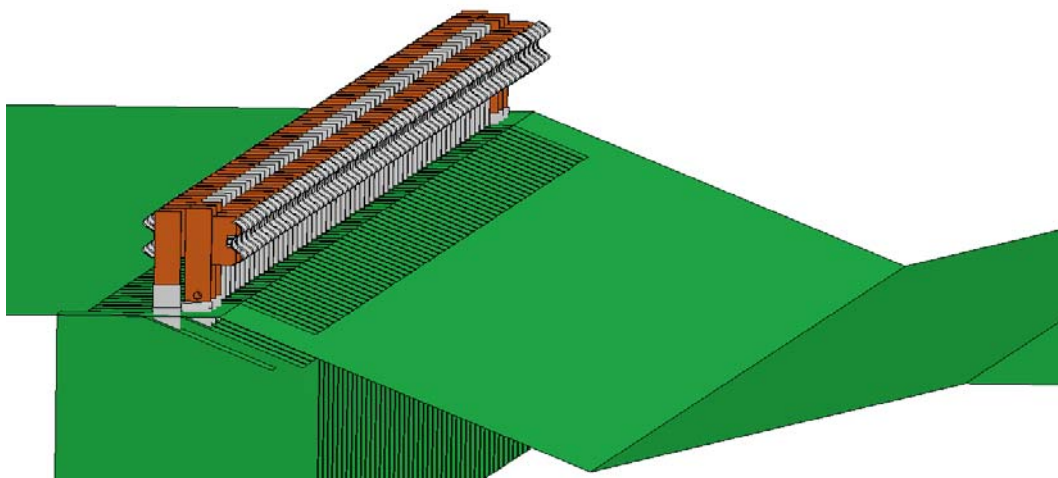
FE model of the lowered backside double-faced guardrail installed on a 2.5H:1V slope.
